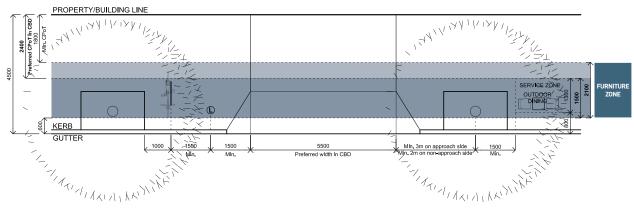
Typical Element Arrangement Diagram on a 4.5m wide Footway
